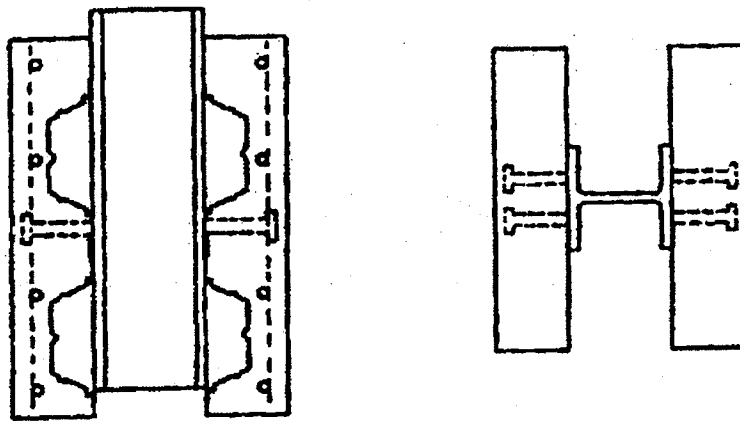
Typical Push-out Test Specimen (Type 1)
